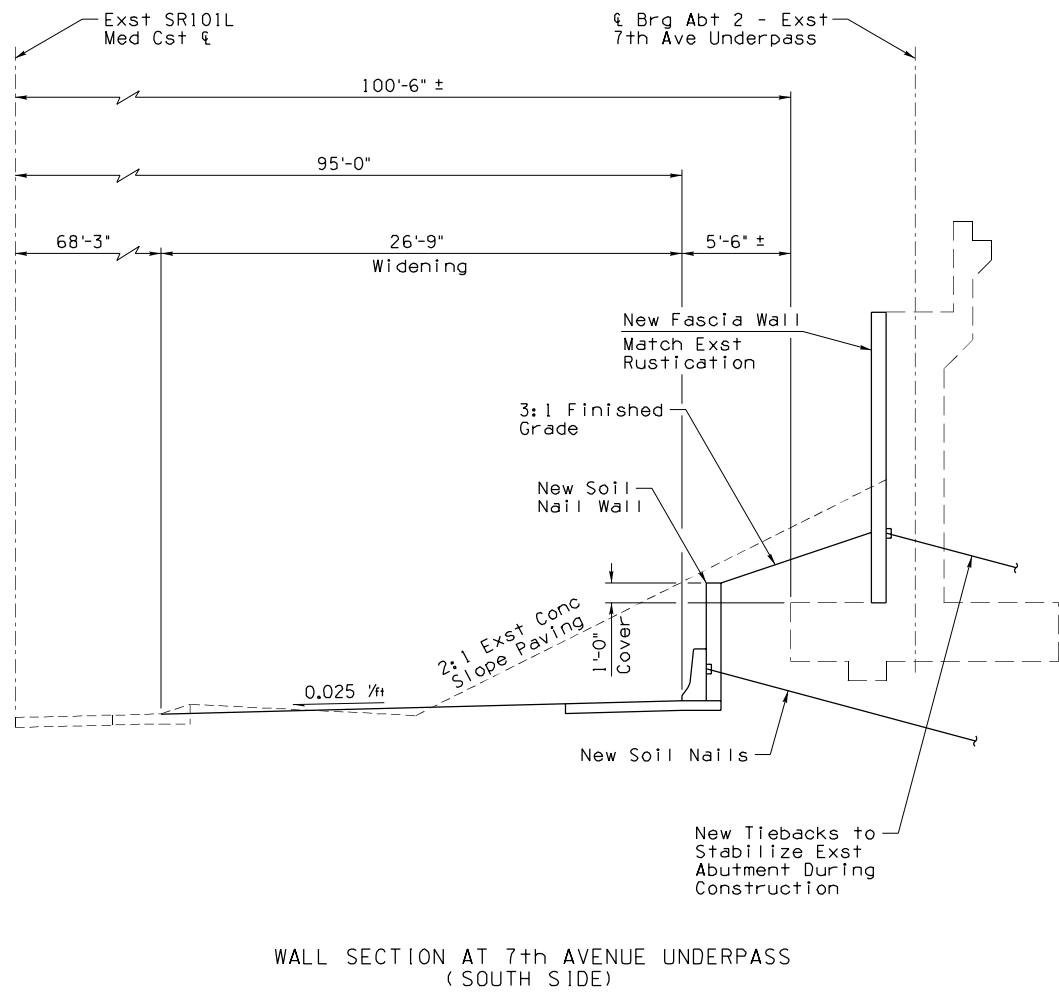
7th Avenue Soil Nail Wall Concept (South Side)
